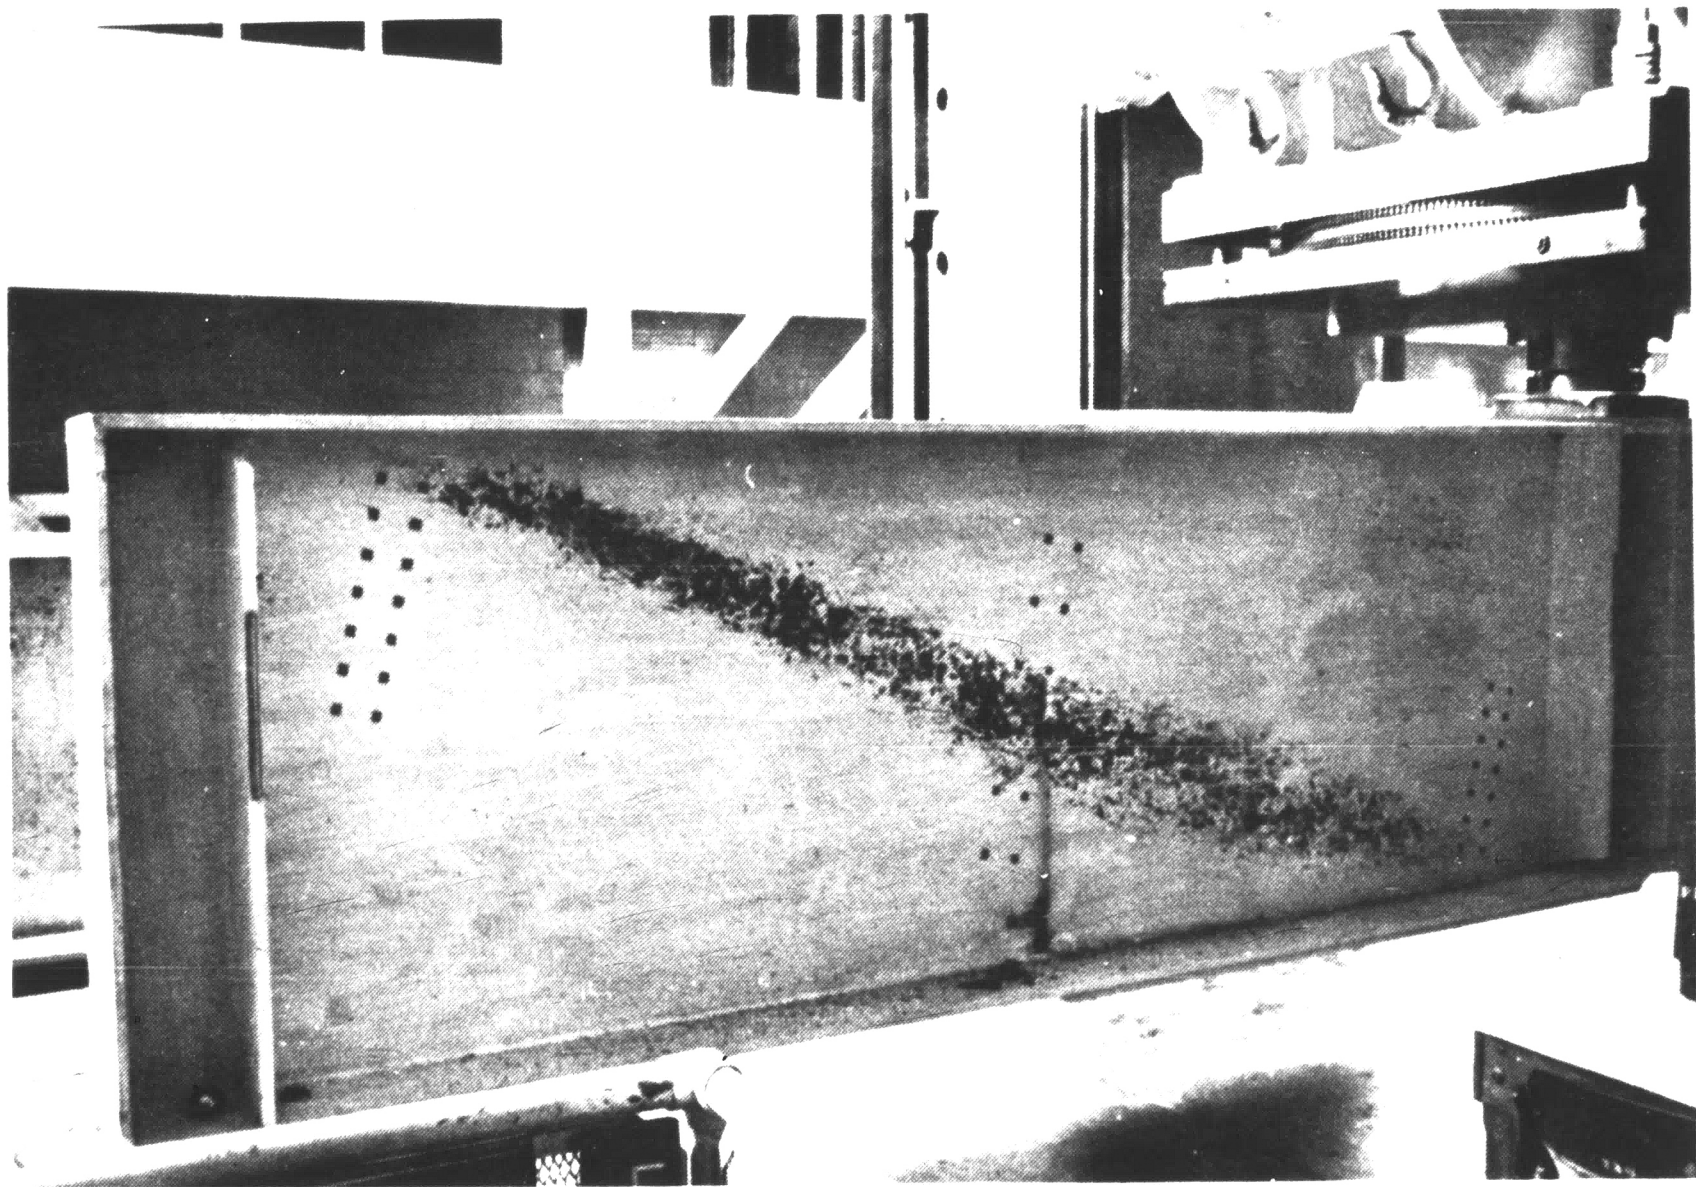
Girder Panel at Failure, Test HI-T1
